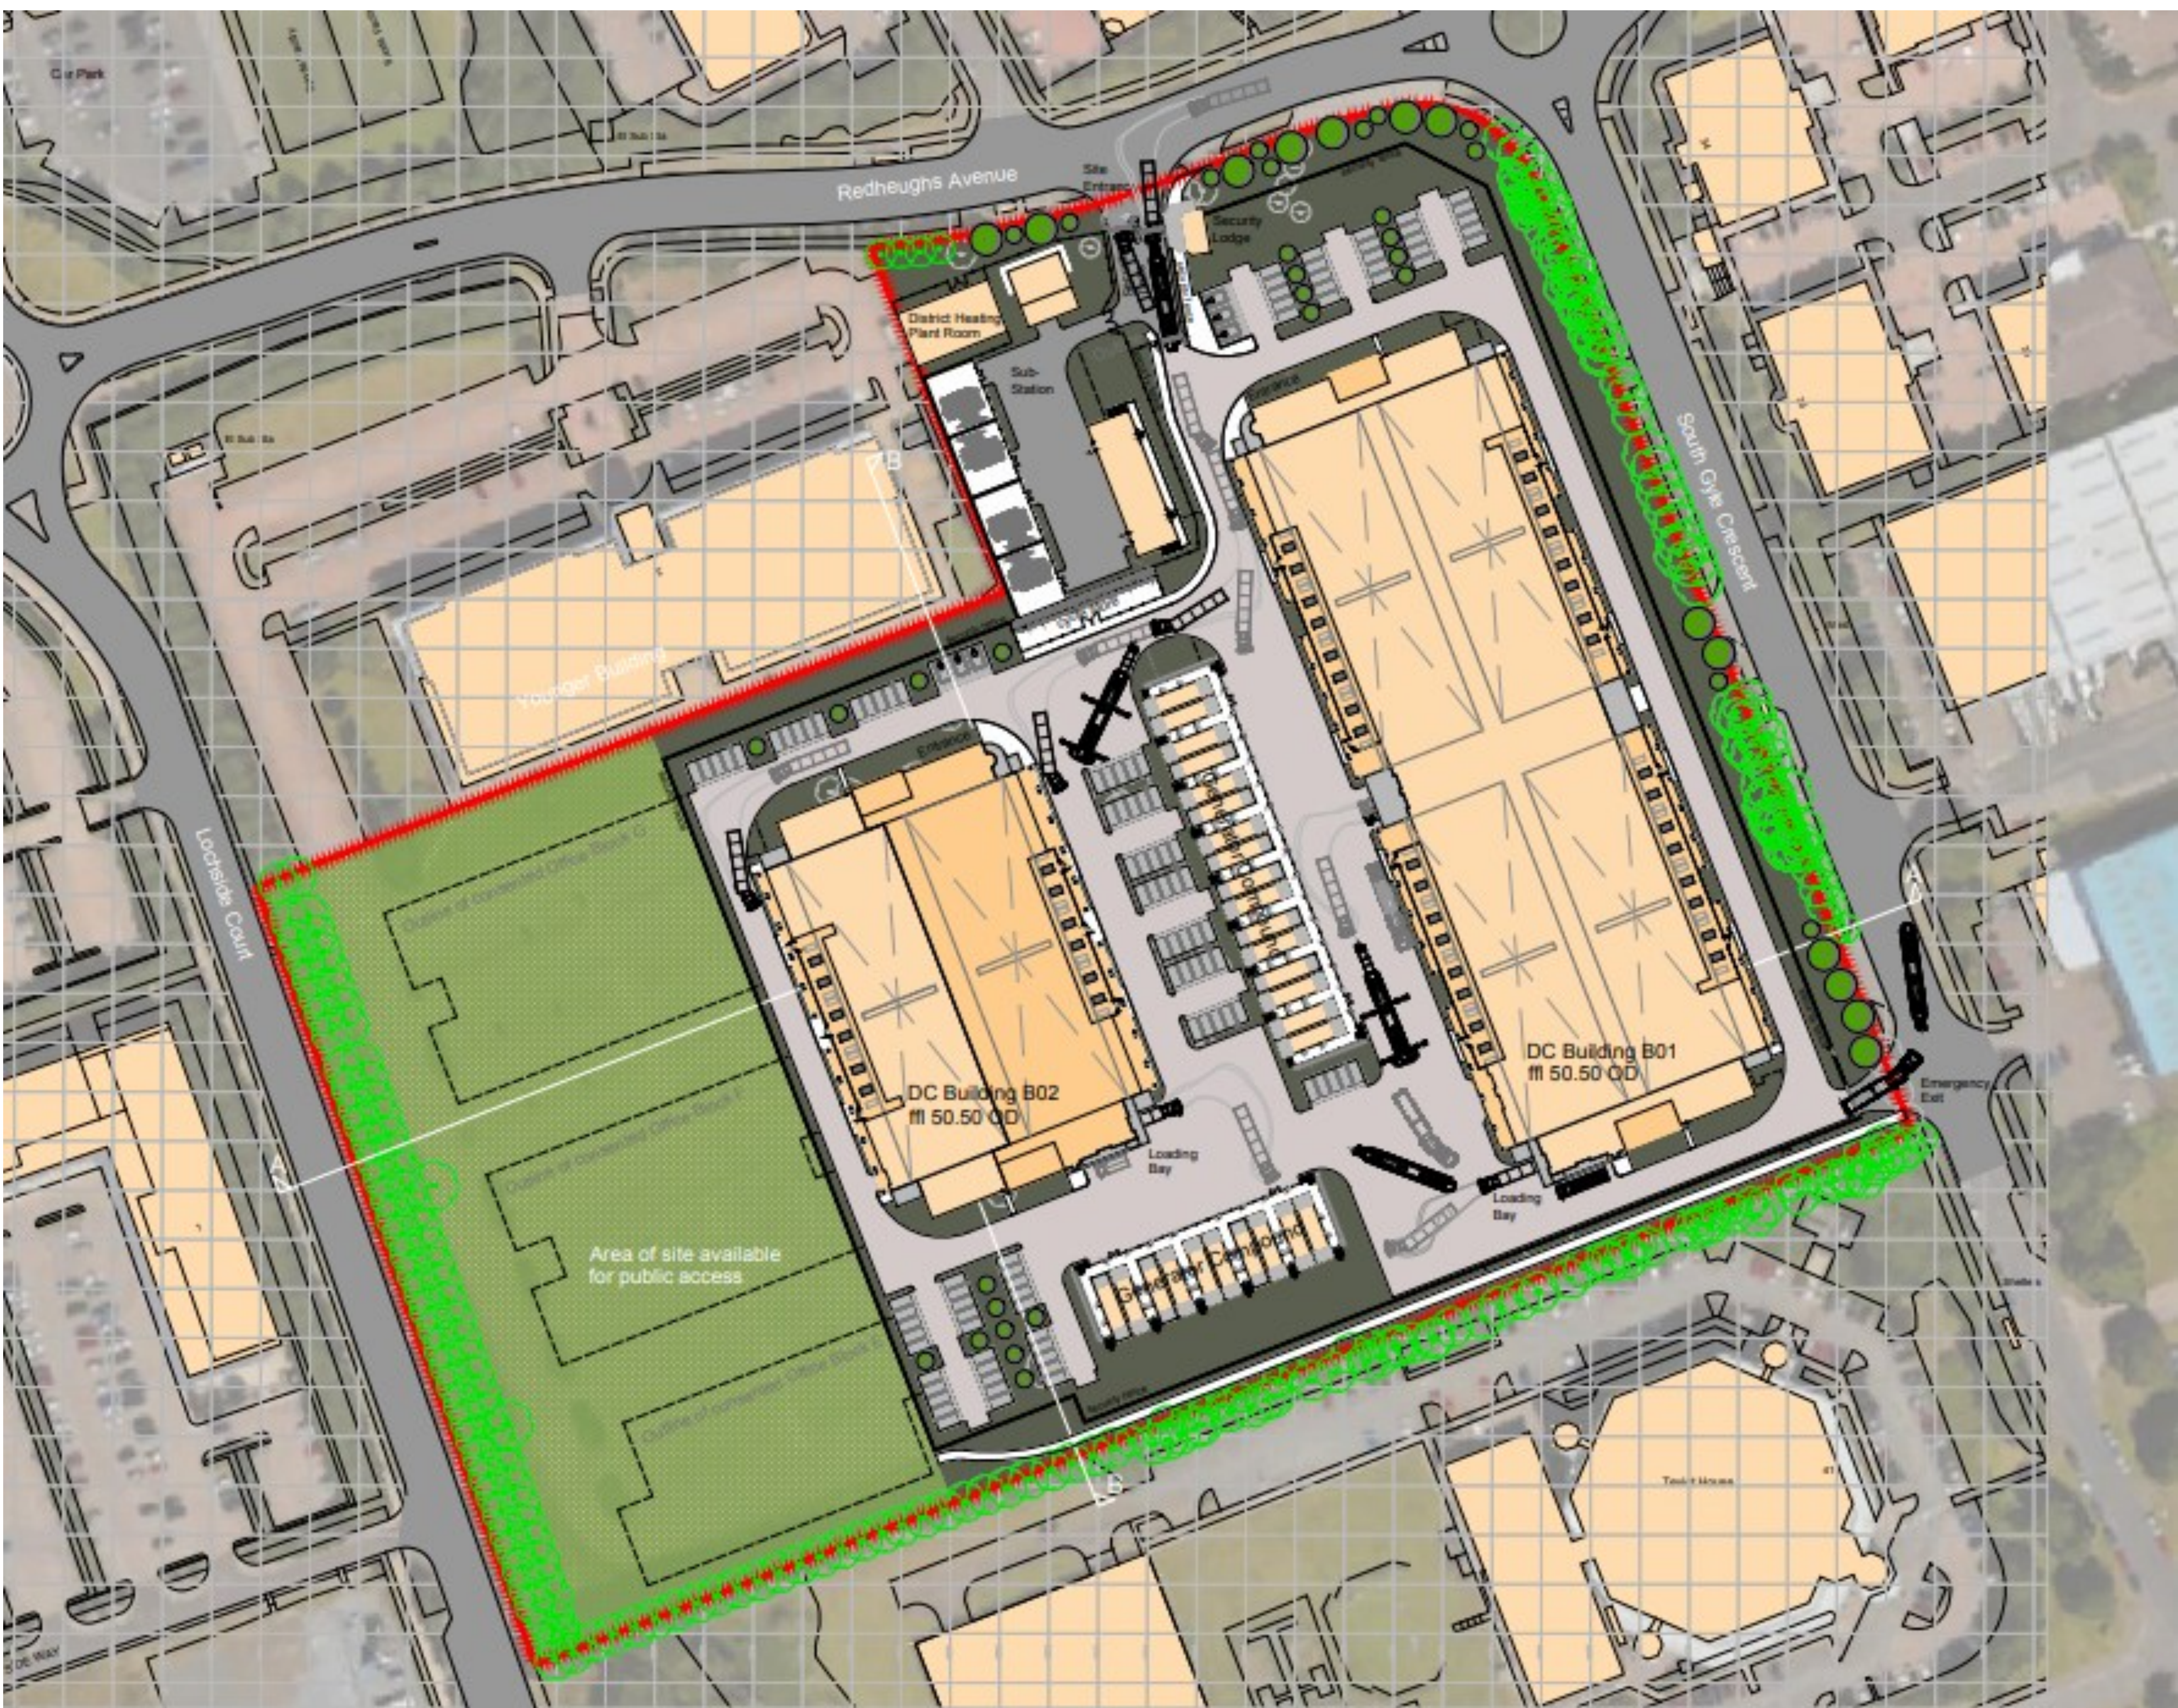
Proposed illustrative Layout Plan : Source: studioNWA Architects
